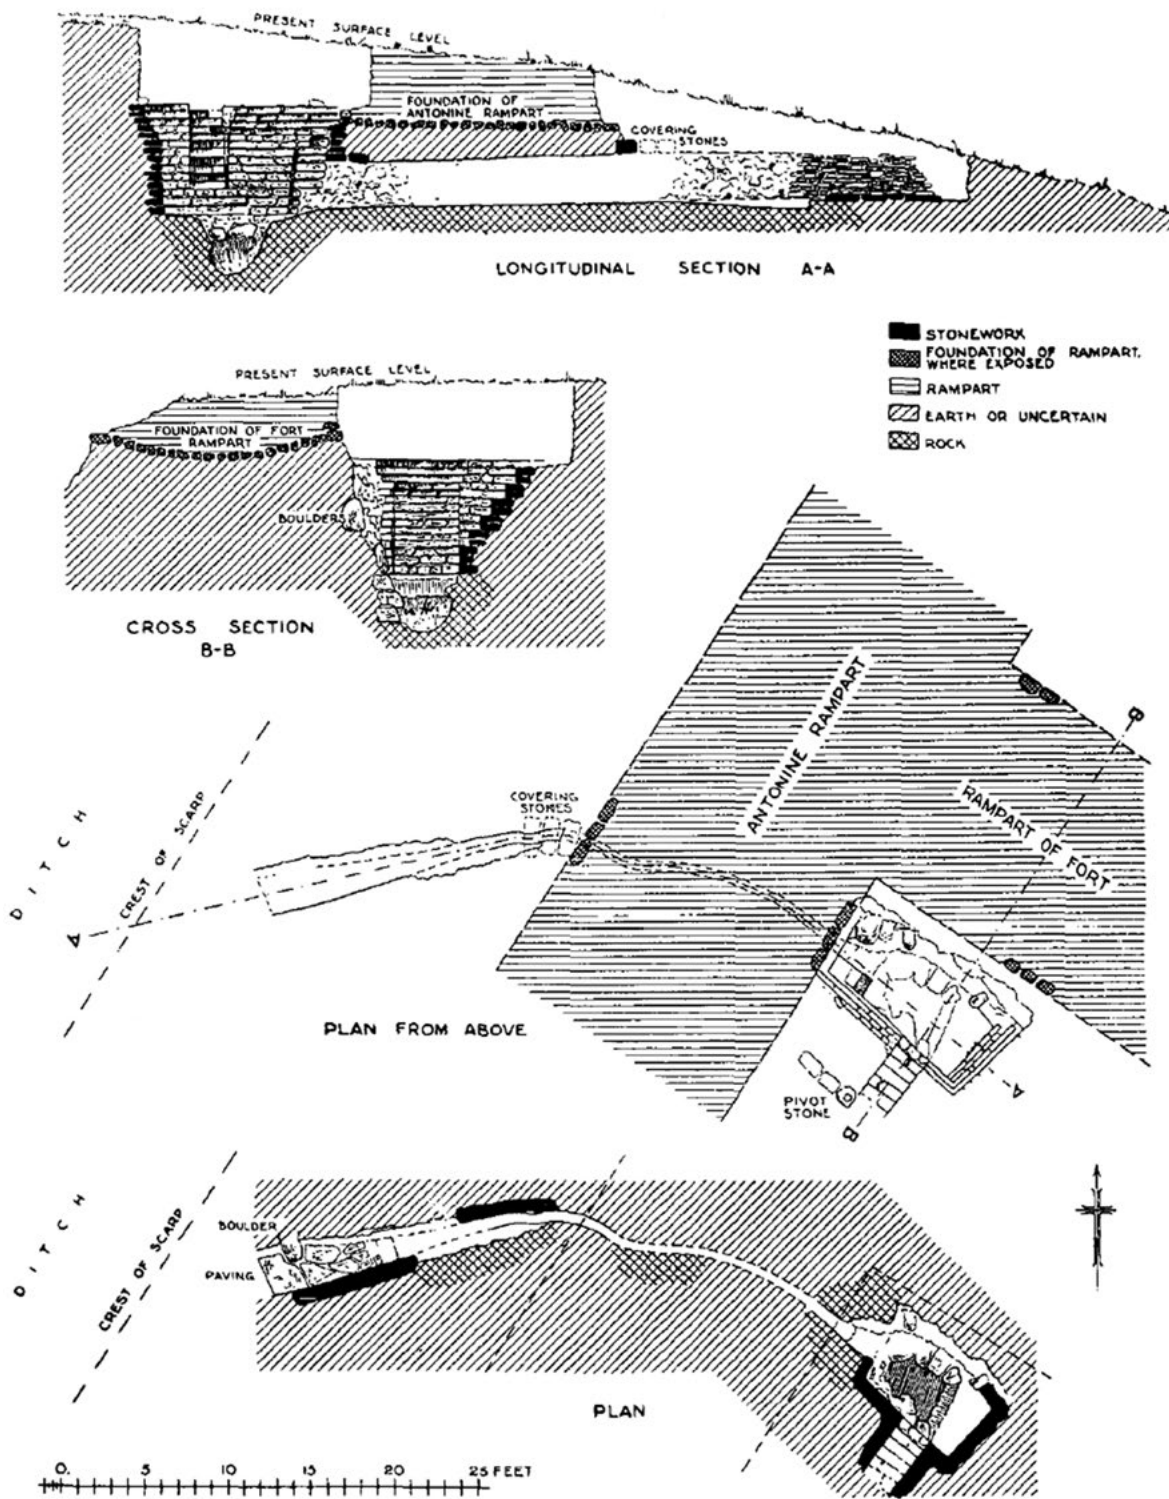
Plans and sections of stone-lined pit beneath the north-east angle-tower of fort at Croy Hill (after Macdonald 1932: fig. 12).
